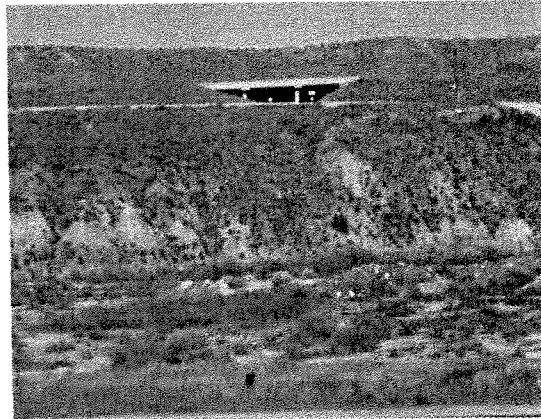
The existing Spring Canyon road underpass is not accessible to an animal in the Santa Clara River.
